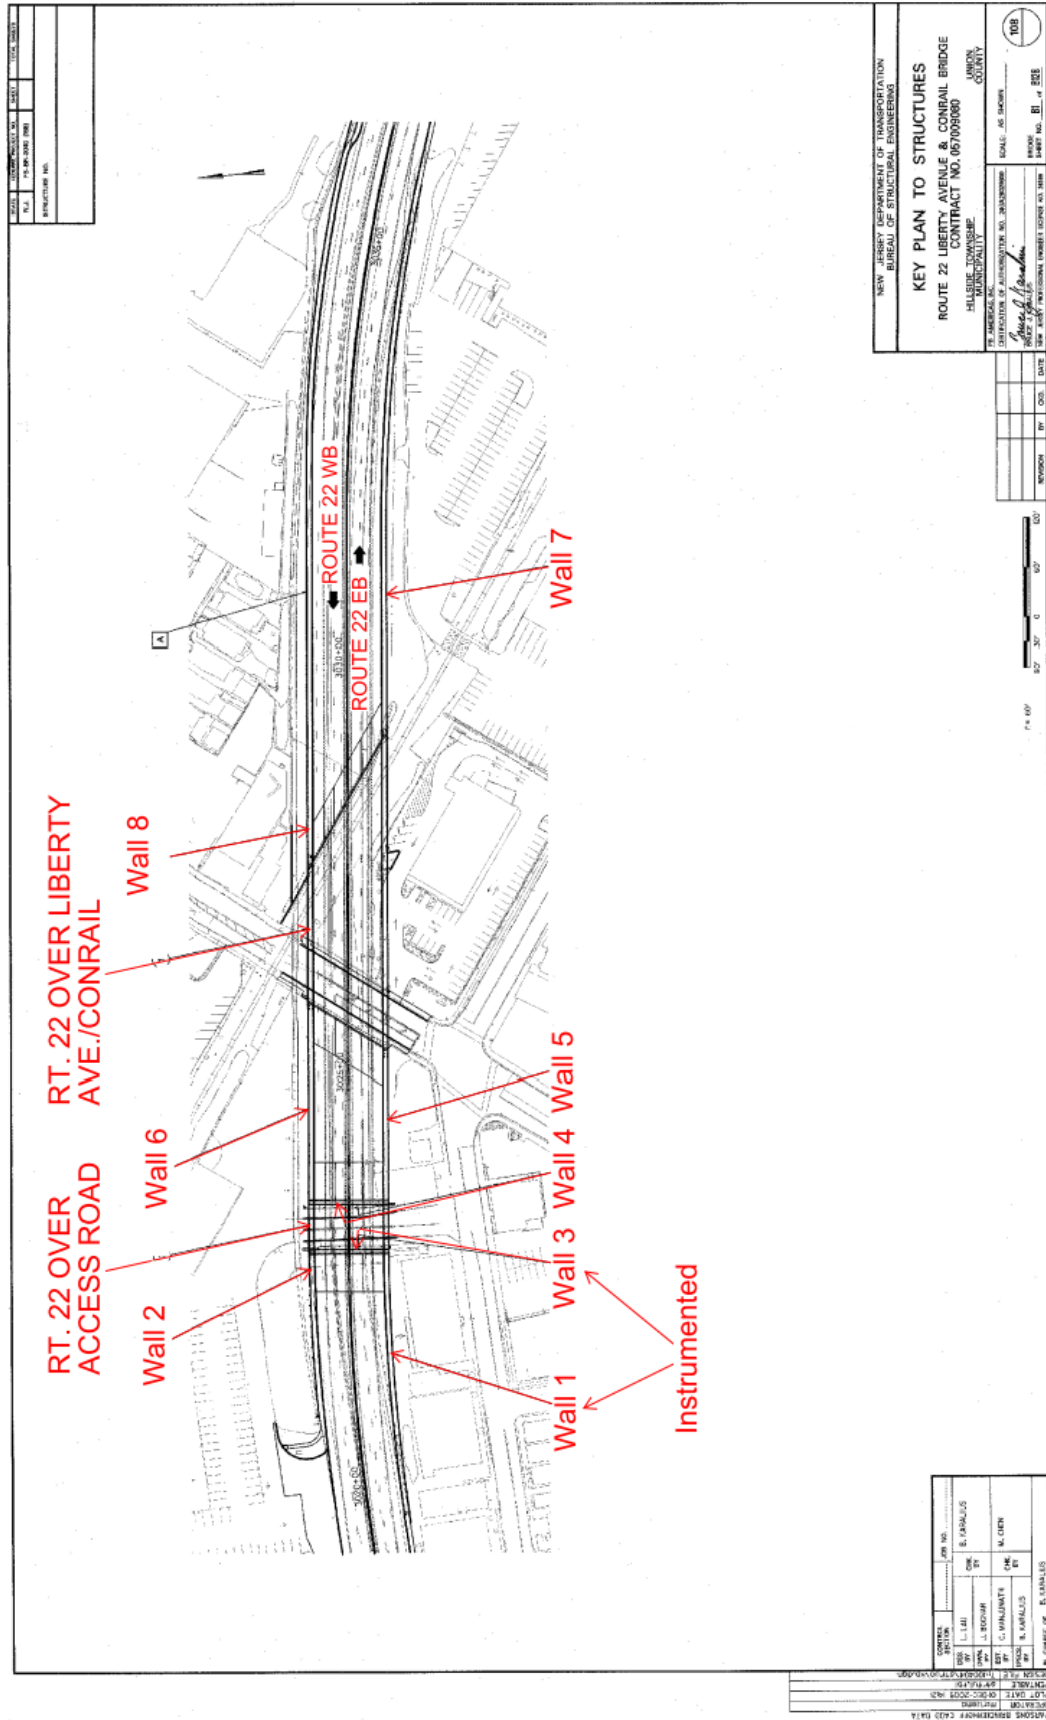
Route 22 over Liberty Avenue and Conrail Site Plan
